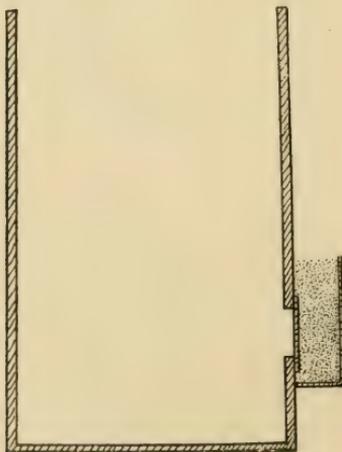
How openings, if desired at the lower parts of bins for taking out the stored grain, may be protected with sand.
